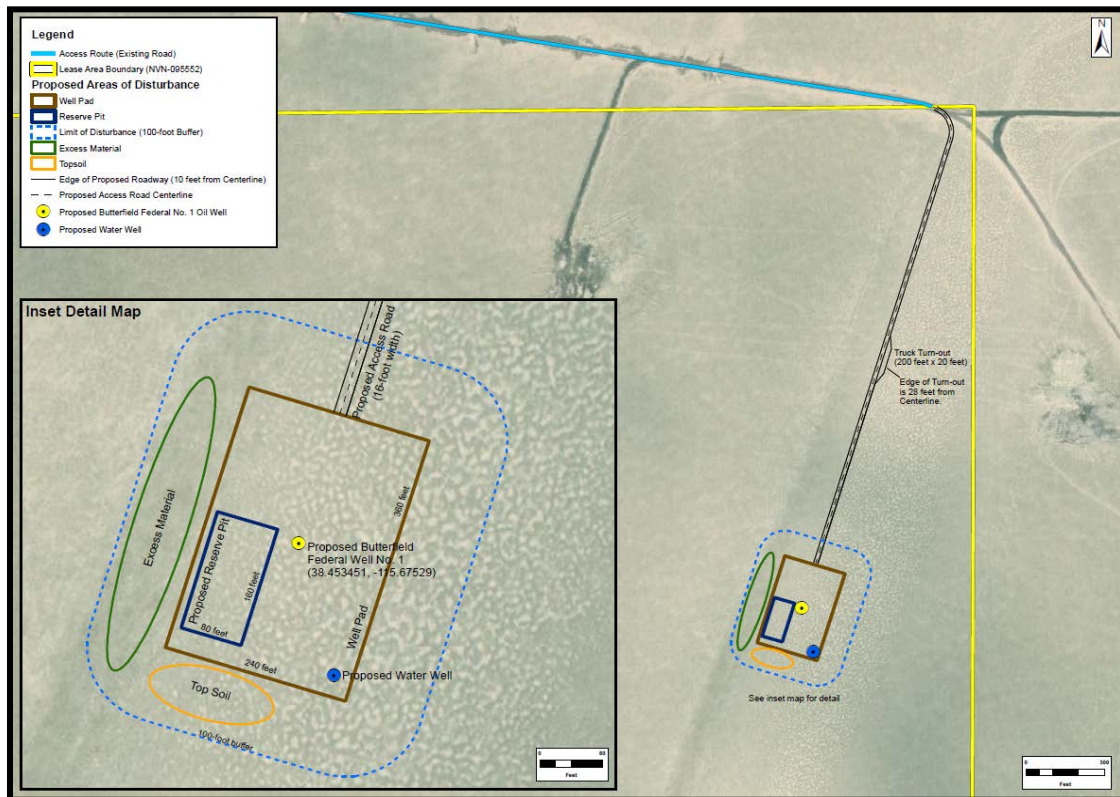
Layout of well pad showing pad area, reserve pit, and well location
